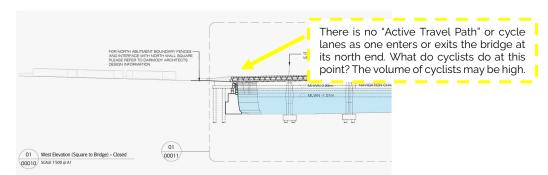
Excerpt from 'SPAR Bridge Proposed West Elevation' (Source: Dwg. No. MOXON-SBR-SP-DR-A-100-00010)
